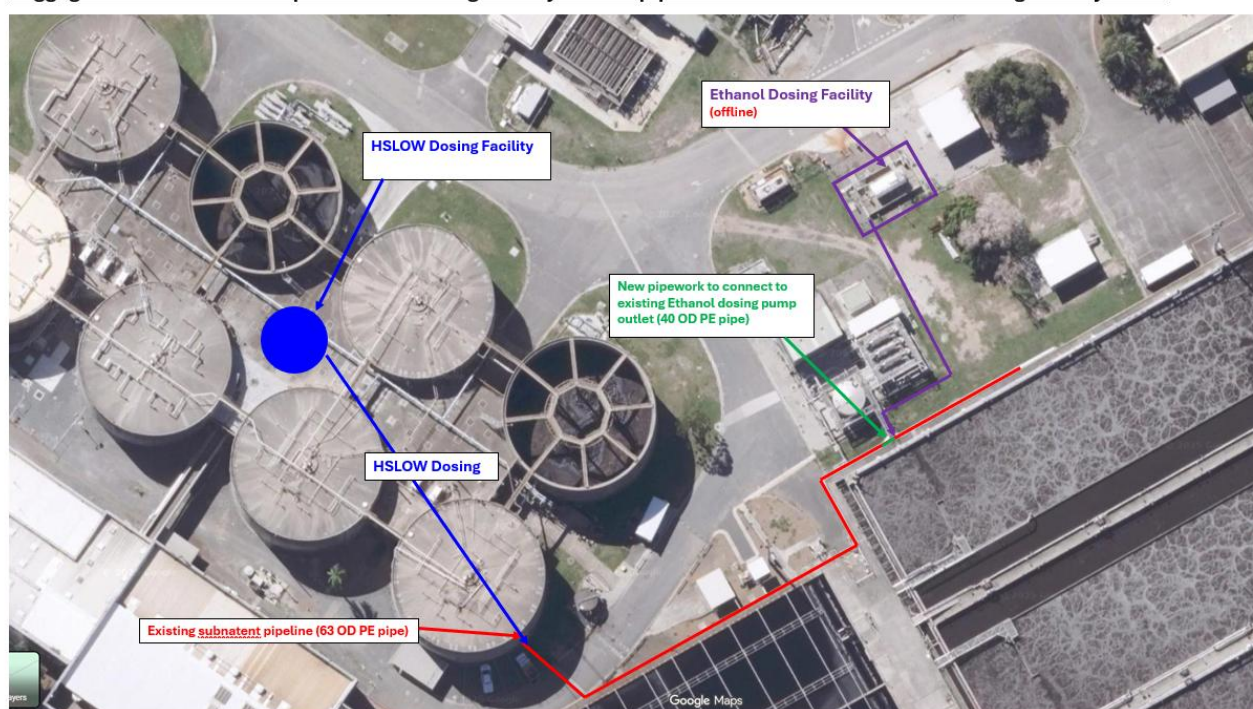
Luggage Point RRC - HSLOW Facility, Repurpose and New Connections
